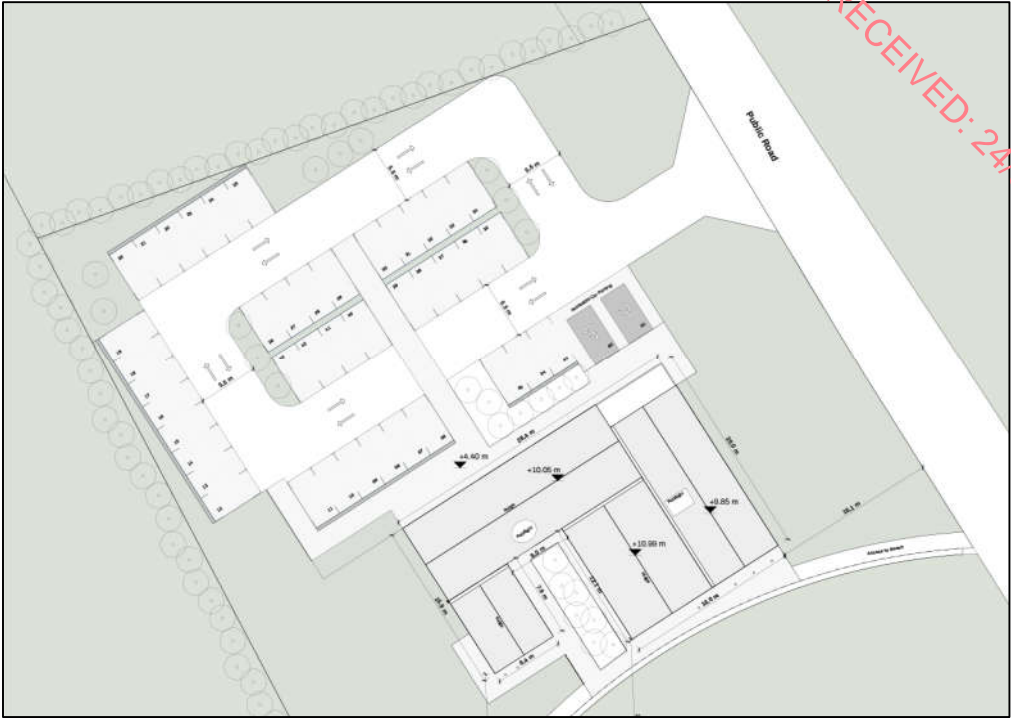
Site layout for preliminary larger design for beach surf school and café.
